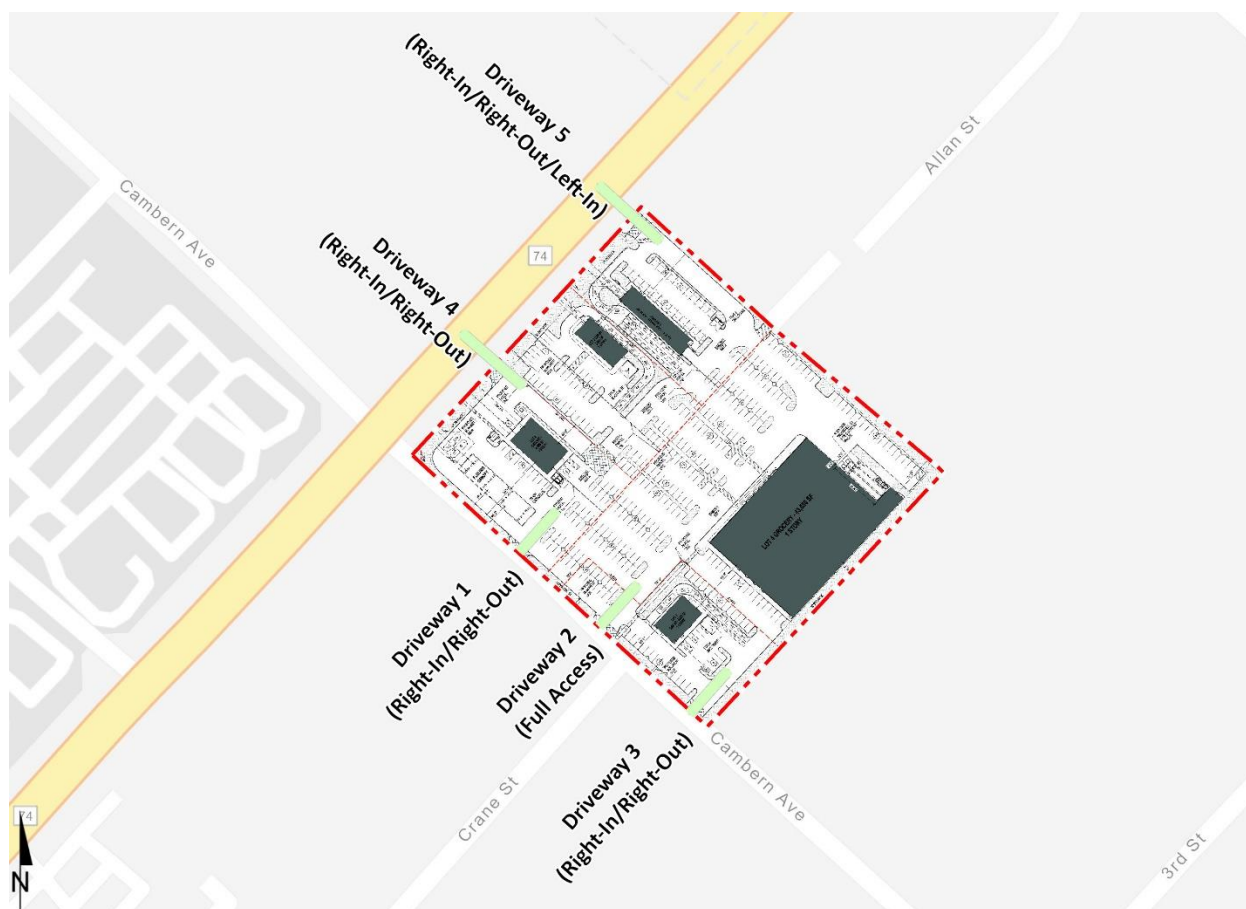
PRELIMINARY SITE PLAN
